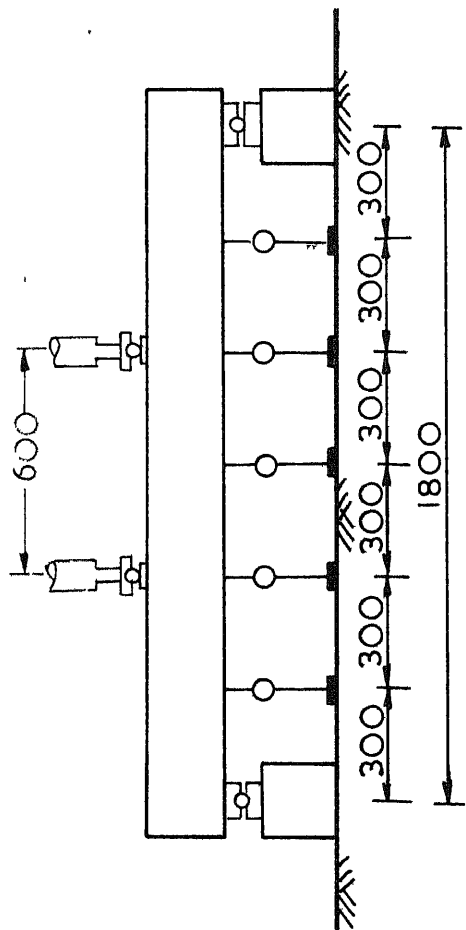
SIMPLY SUPPORTED BEAM (TEST SETUP)
